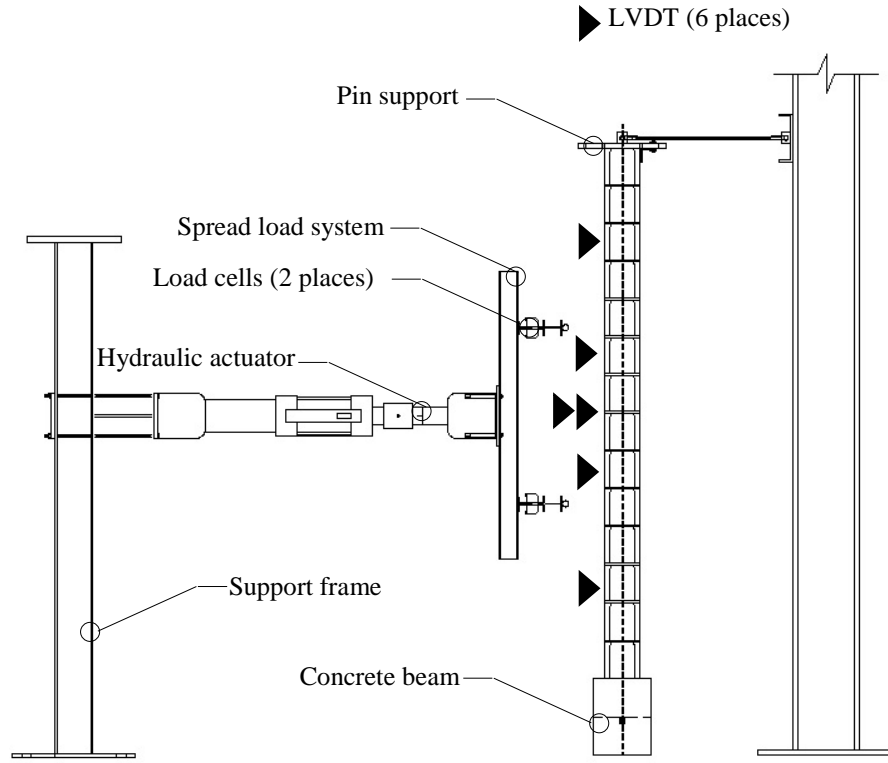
Schematic of loading arrangement and LVDT placement.
